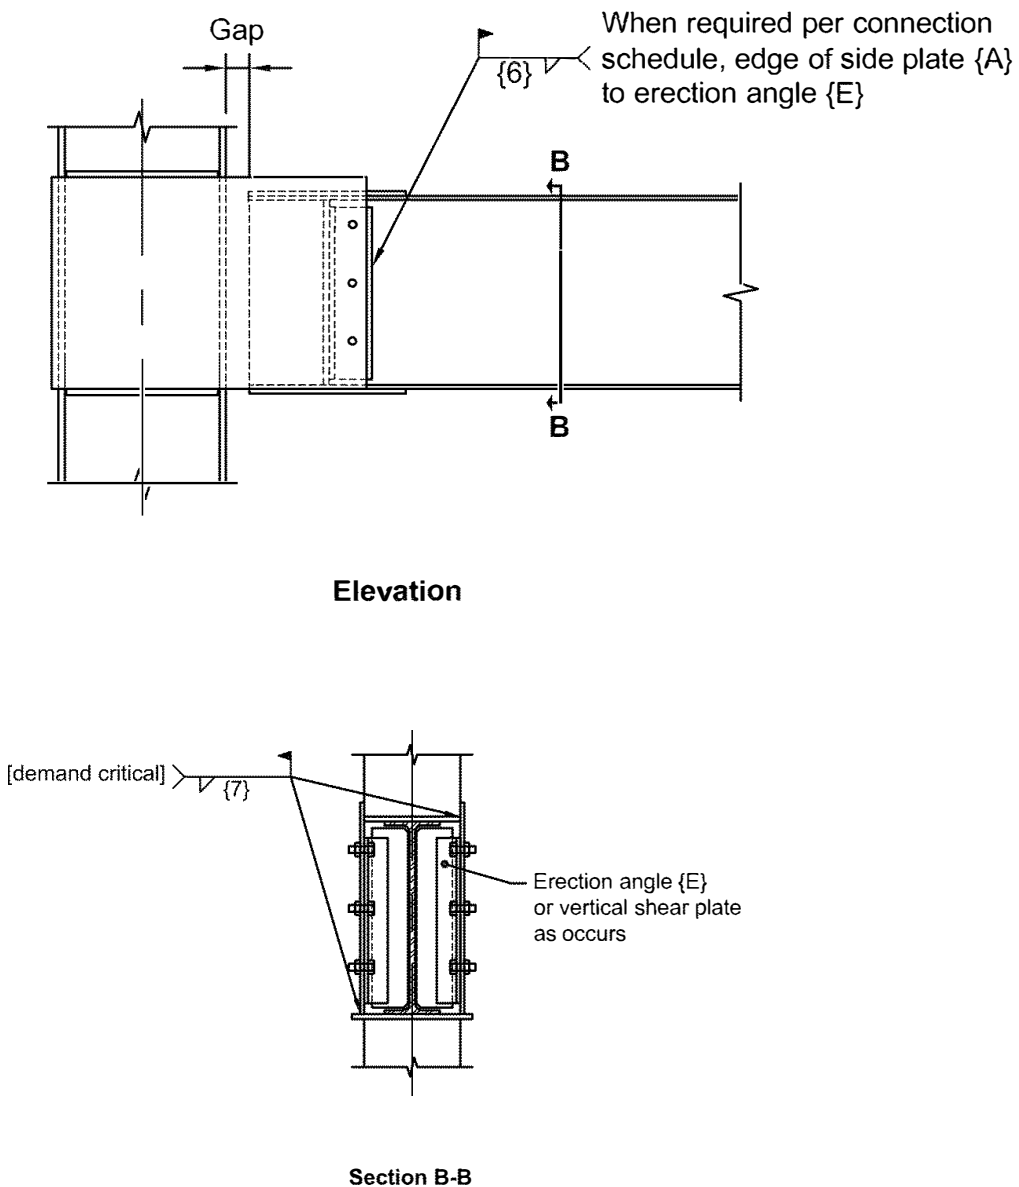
Full-length beam-to-side plate field erection detail.
